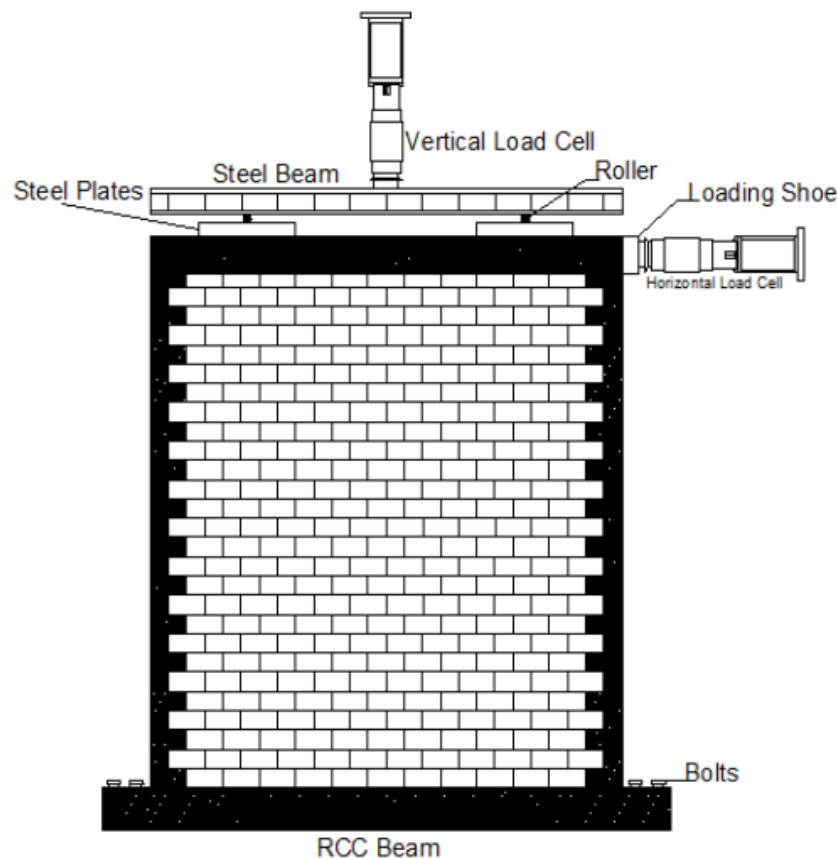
Preparation and Testing Setup of DSBM Wall
